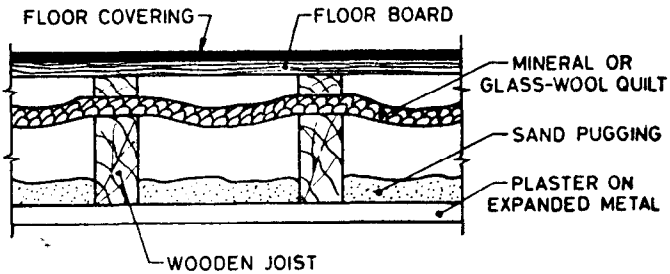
EXISTING TIMBER FLOORS, FLOATING CONSTRUCTION
